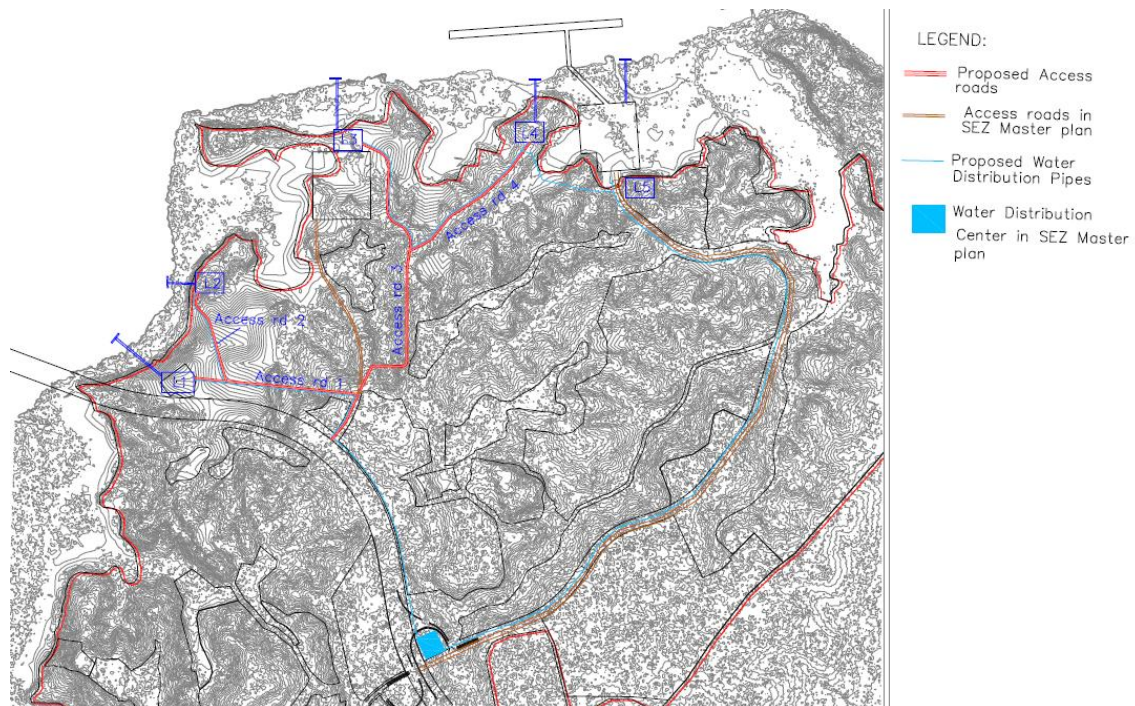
Proposed access road and utility installation in SEZ<sup>42</sup>
